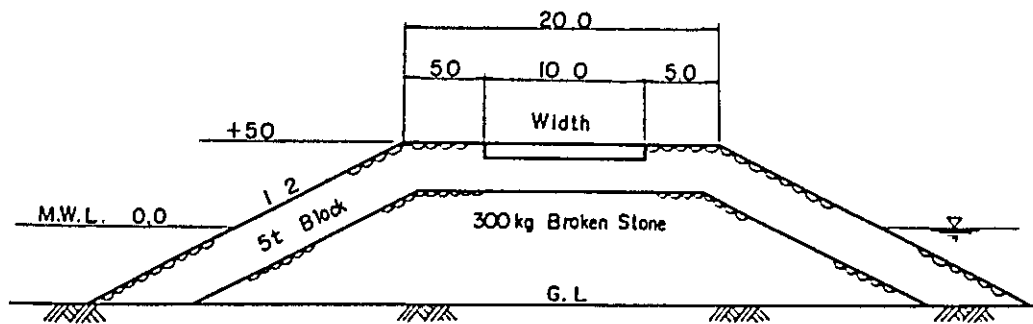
CROSS SECTION OF CAUSEWAY (in meters)
